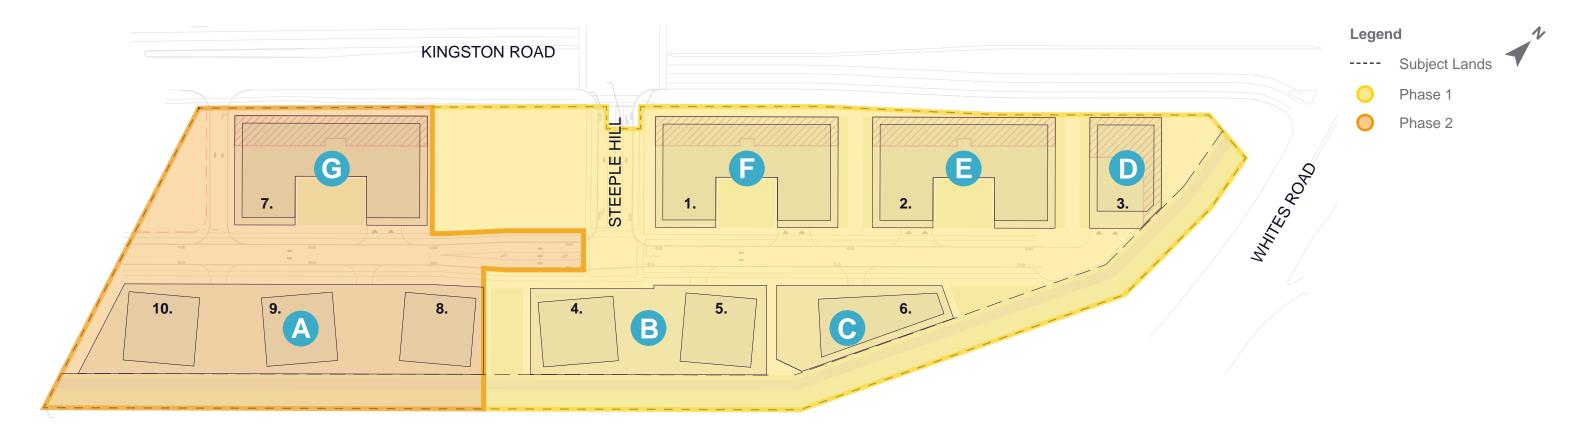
Preliminary Phasing Plan Prepared by Weston Consulting (Based on Site Plan Prepared by Graziani + Corazza Architects)
